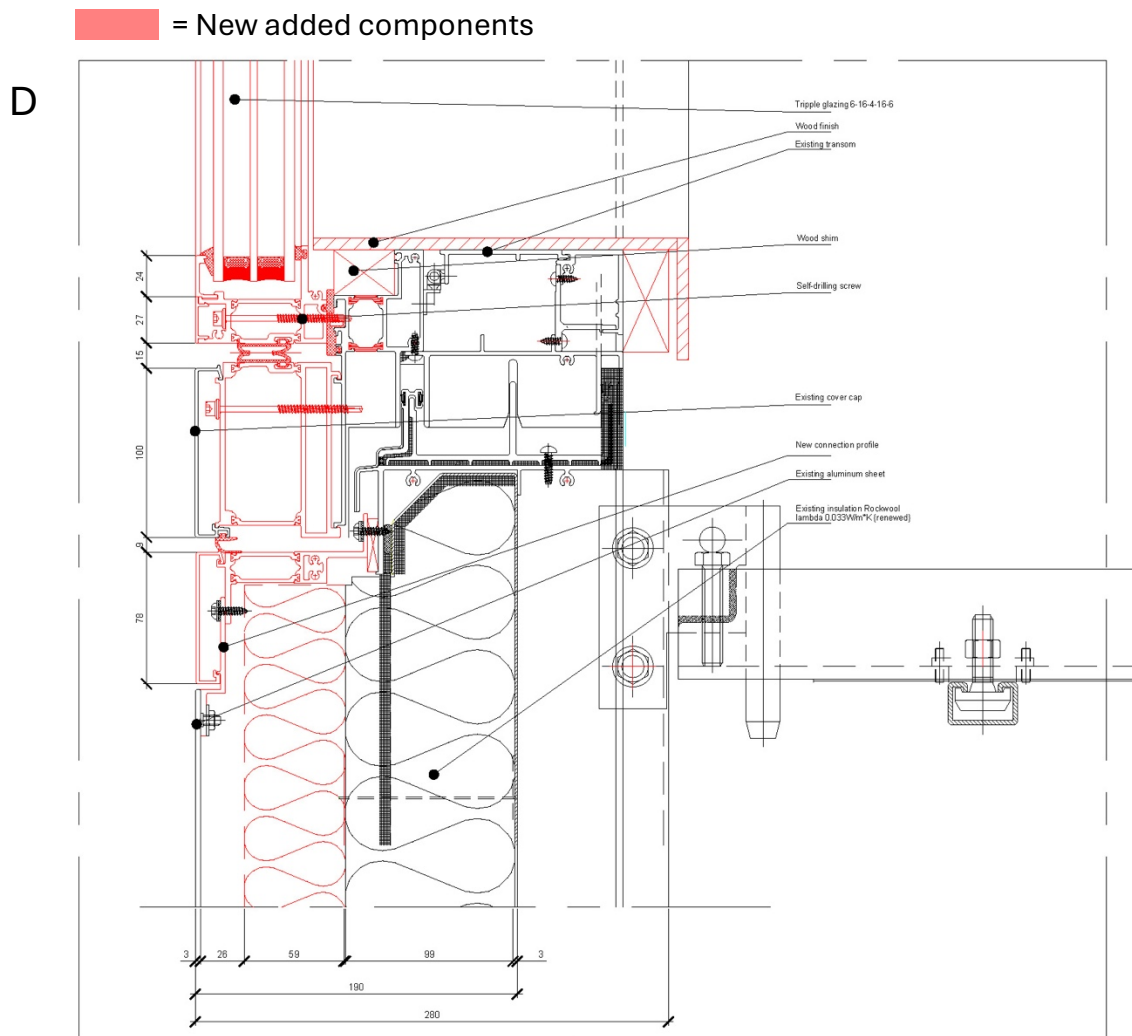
vertical section bottom connection carrier frame (drawing by author).
